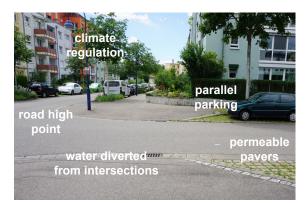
(top right): Central to the surface water management practice in Site C is to divert surface water away from intersections. An elevated crown road design allows for surface water to sheet flow to the edges of intersections (Photo by author).
